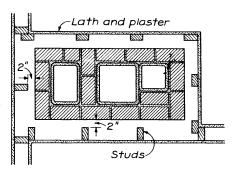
Plan of chimney showing proper arrangement of three flues. Bond division wall with sidewalls by staggering the joints of successive courses. Wood framing should be at least 2 inches from brickwork.
